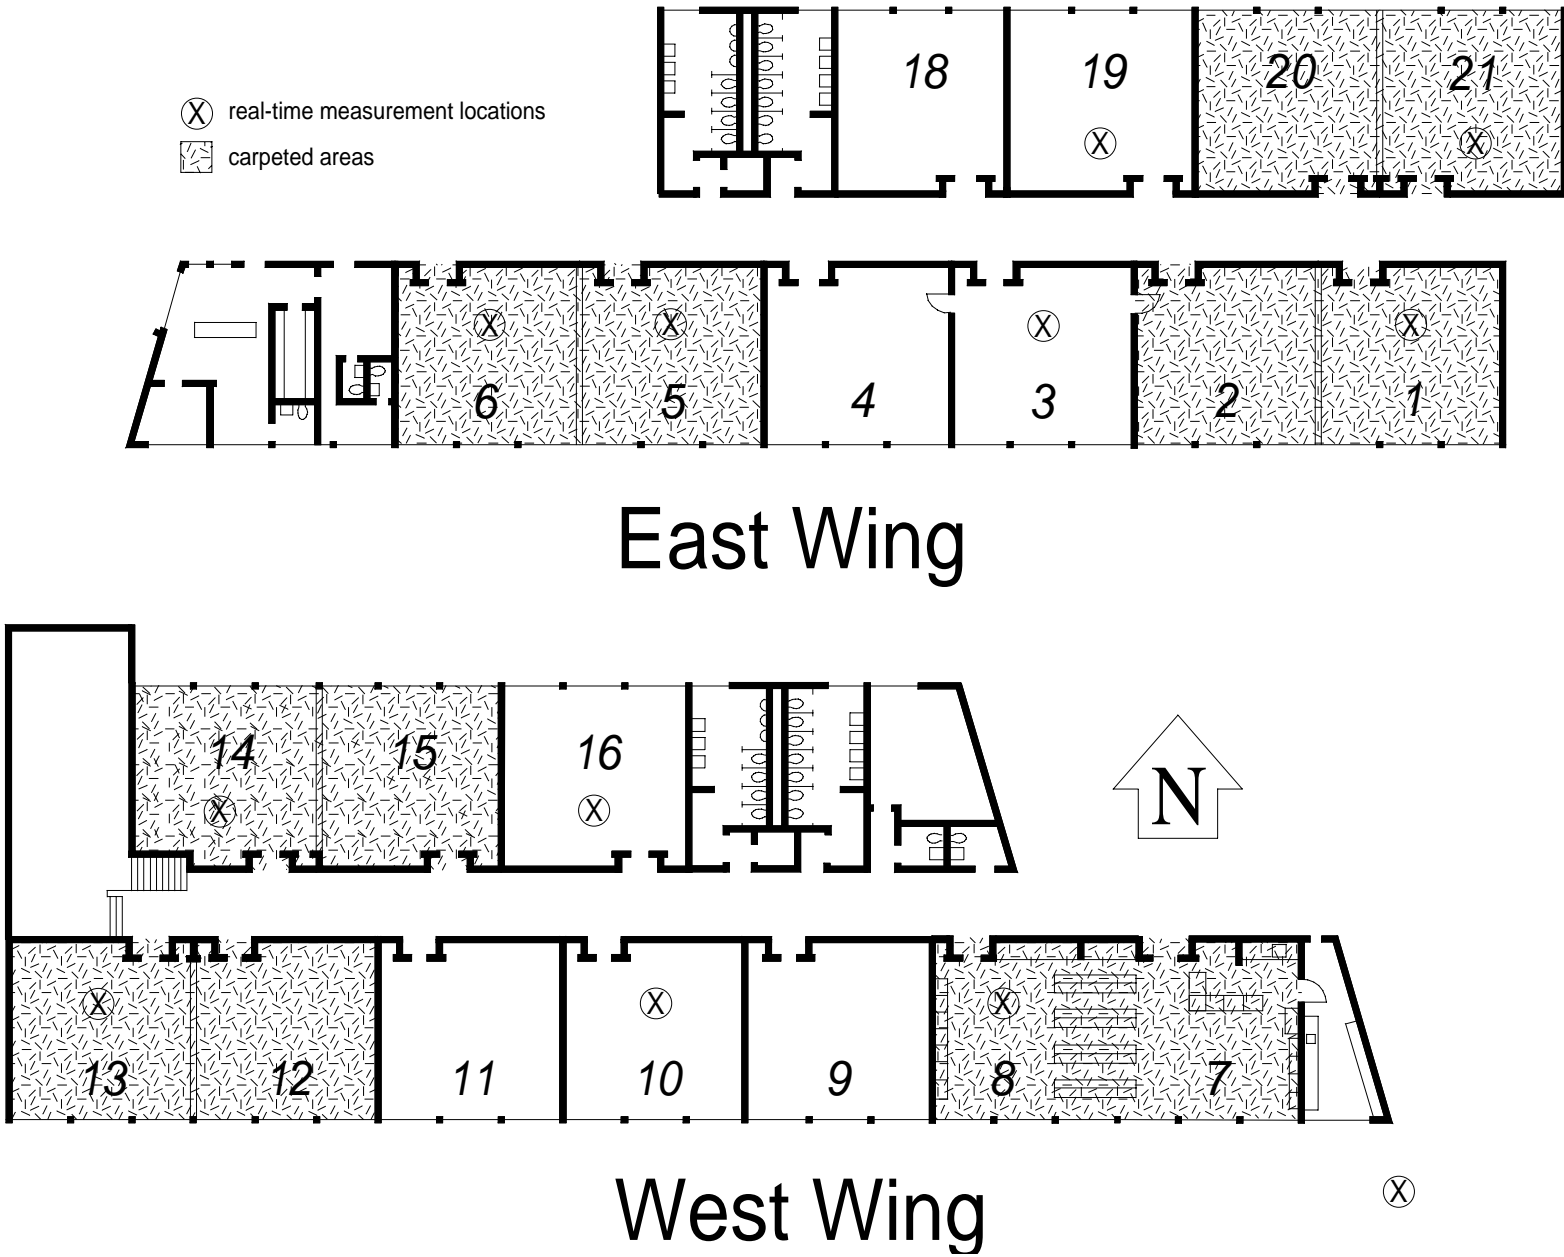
Main Floor Plan Drawing, Houghtaling Elementary School, Ketchikan, Alaska
